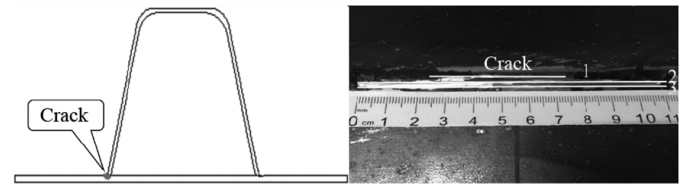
Schematic diagram of crack prefabrication in the steel box girder test piece.
